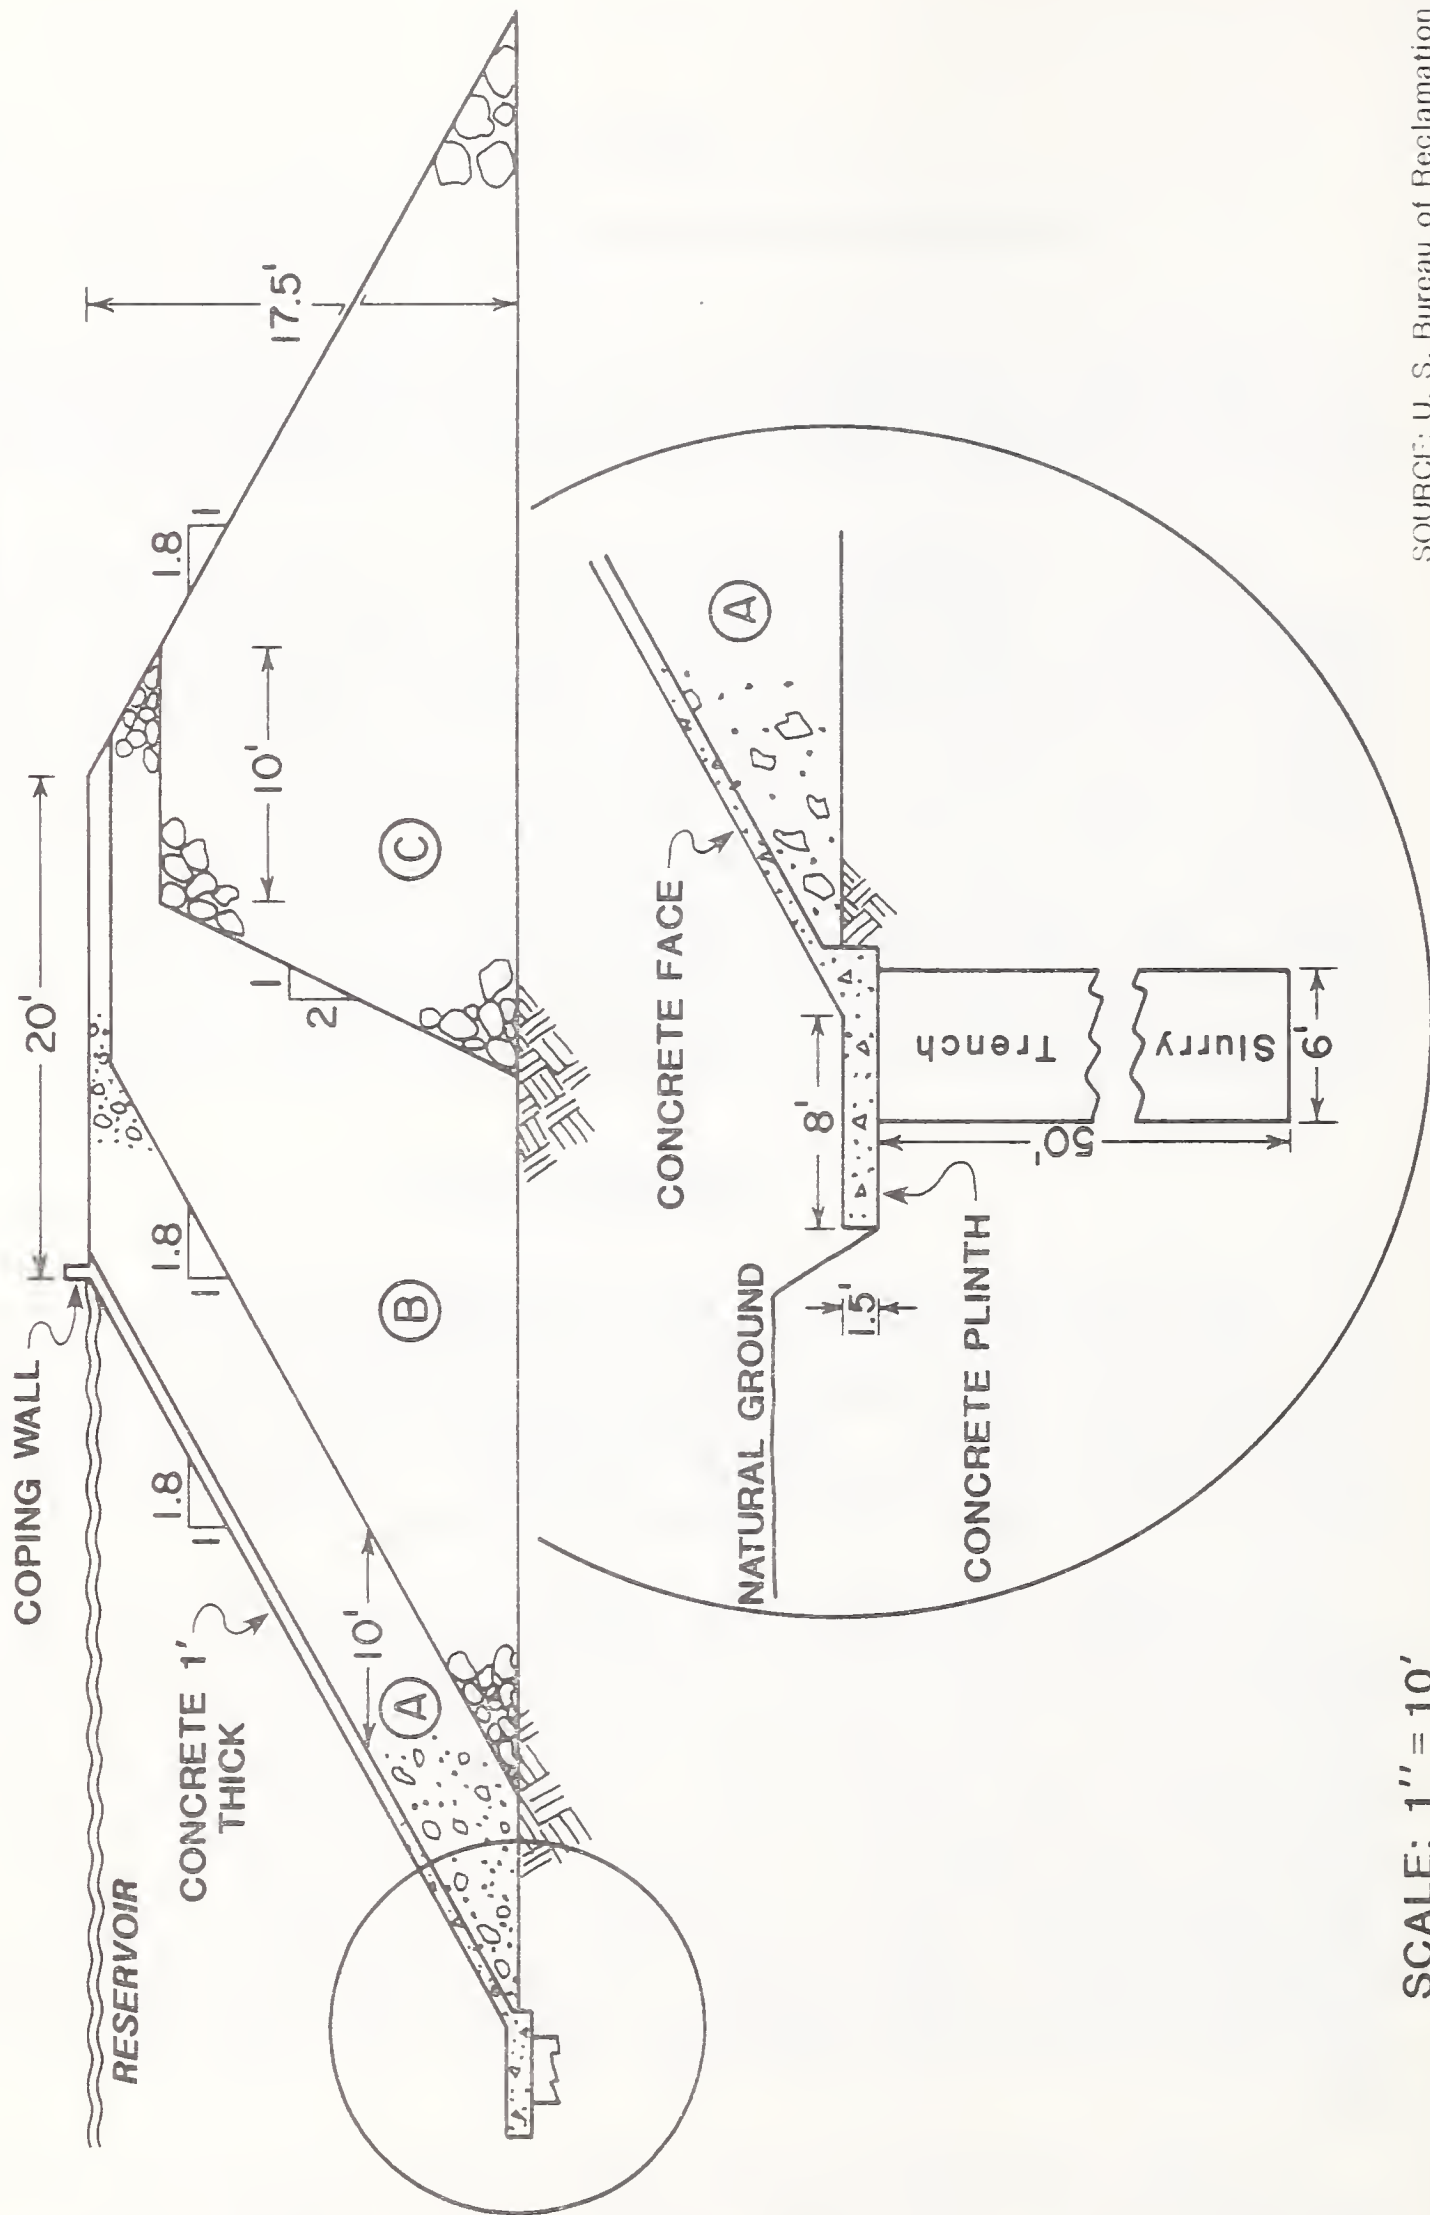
PATTENGAIL CREEK ROCKFILL DAM: TYPICAL CROSS SECTION
